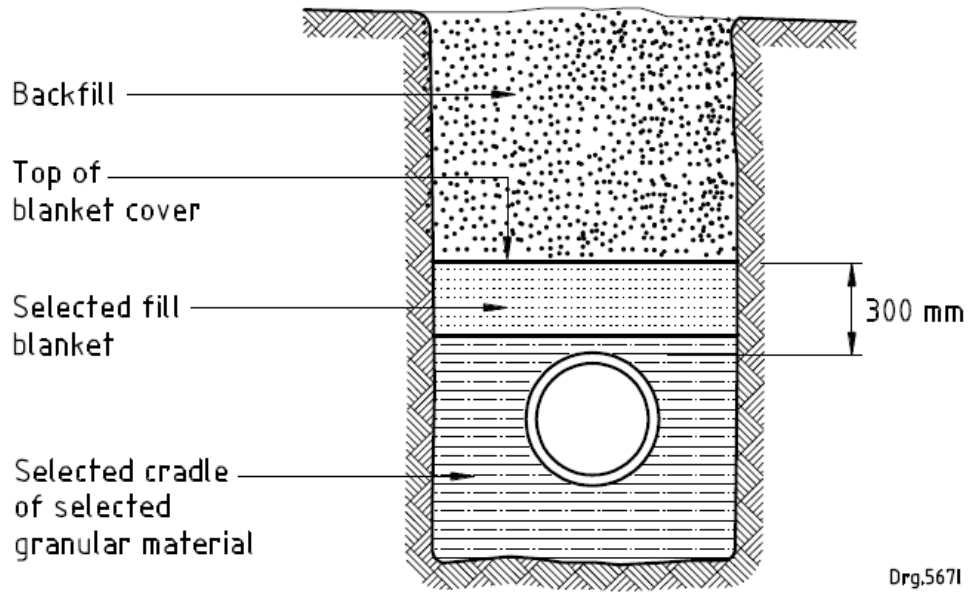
Typical Trench Details for (SANS 1200 DB)
